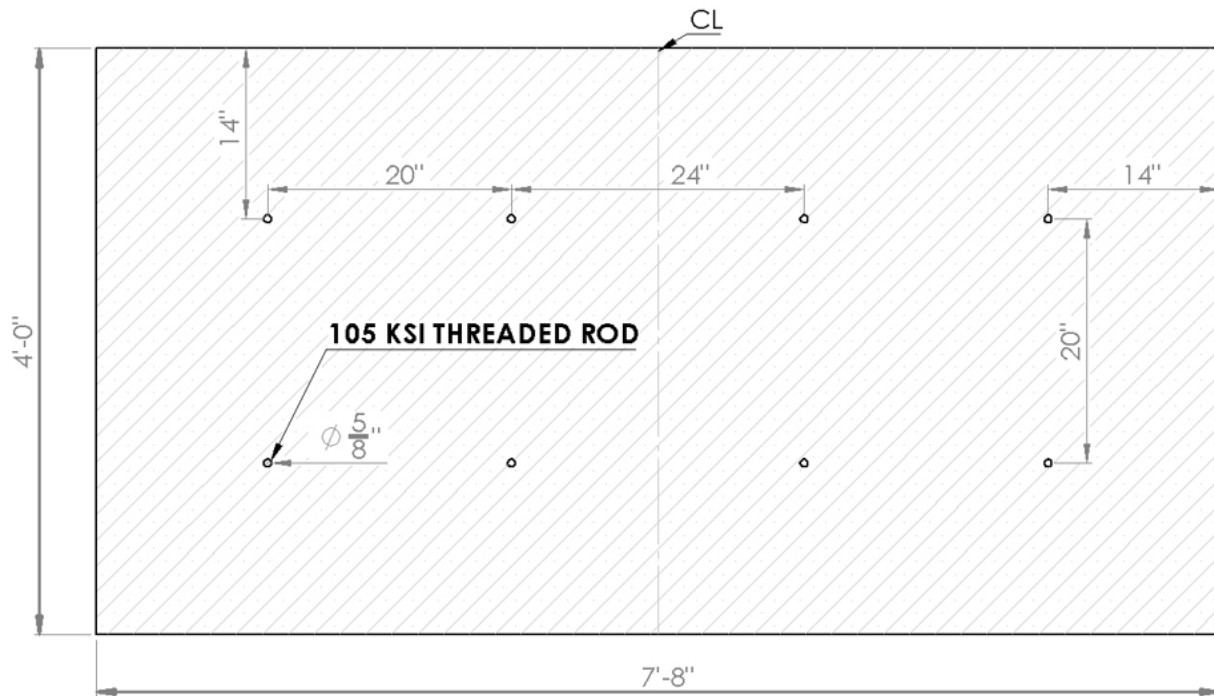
Nonproprietary shear anchor schematic drawing (underside of test panel).
